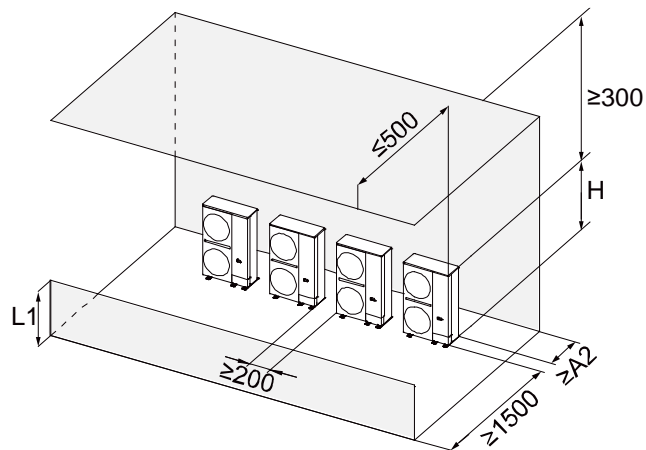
More than one outdoor unit installation (unit: mm)
